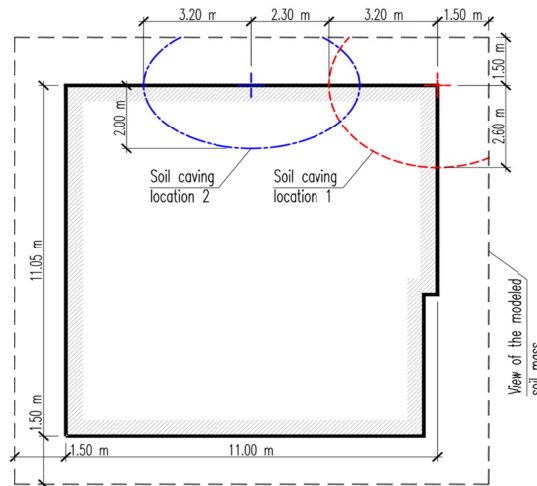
Building plan: Location and general dimensions of the modelled sinkholes
